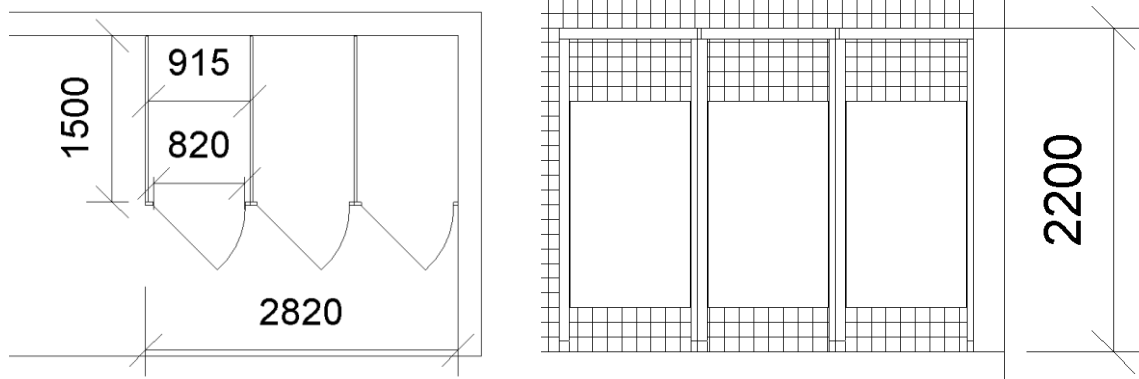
Plan and Elevation View of Toilet and Shower Cubicle Partitions
